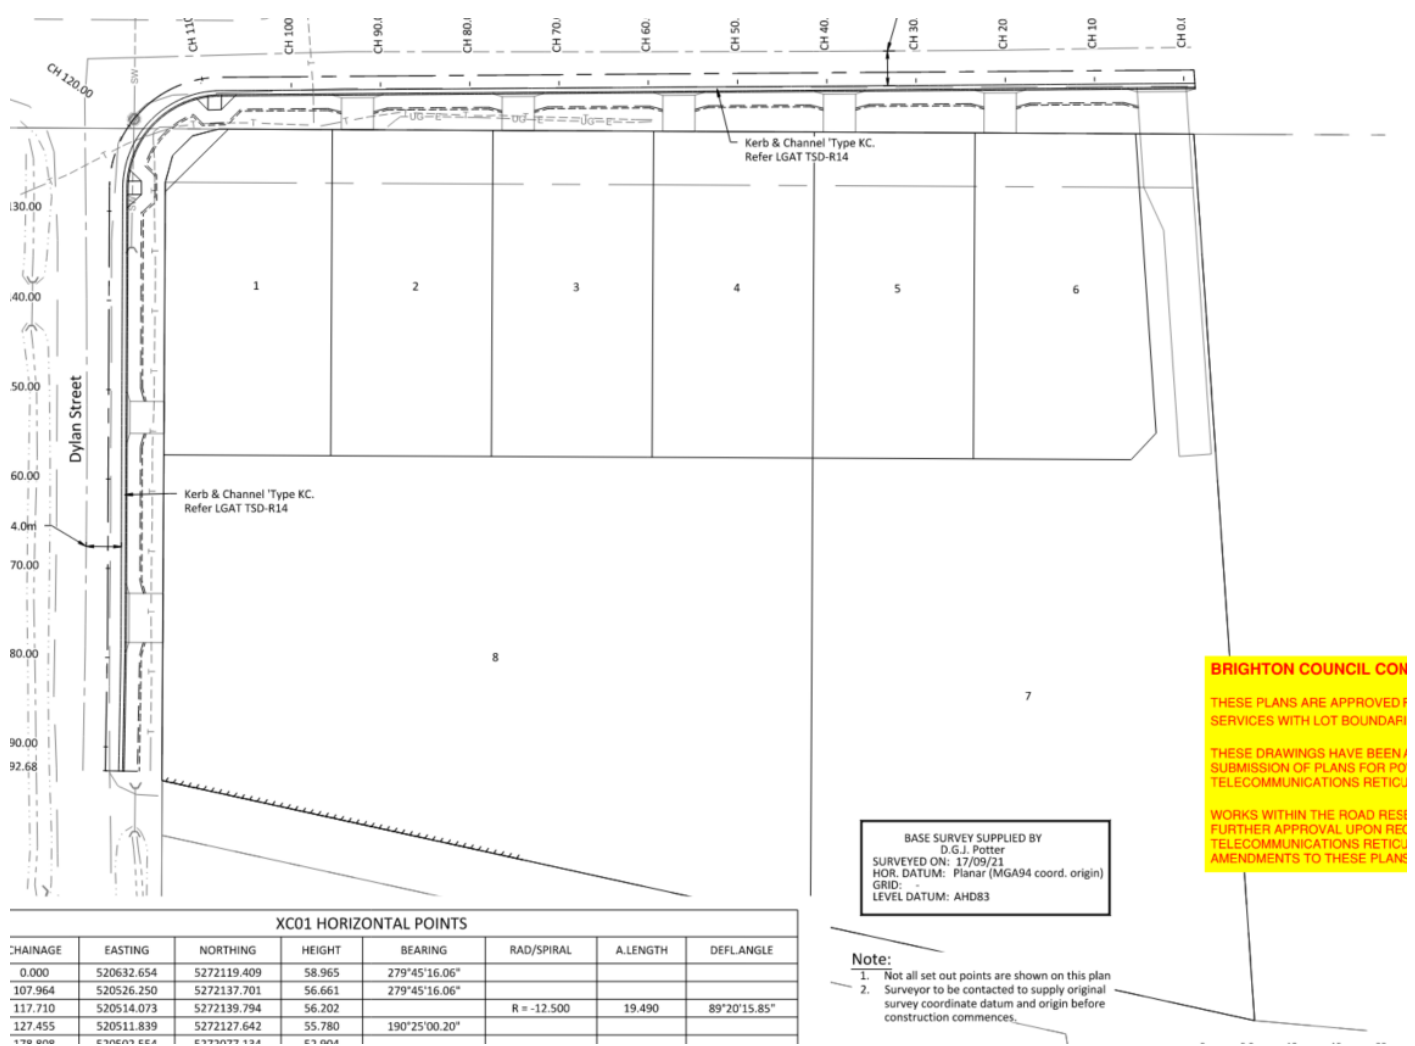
Approved subdivision layout. Proposed childcare centre to be located within lot 8.
